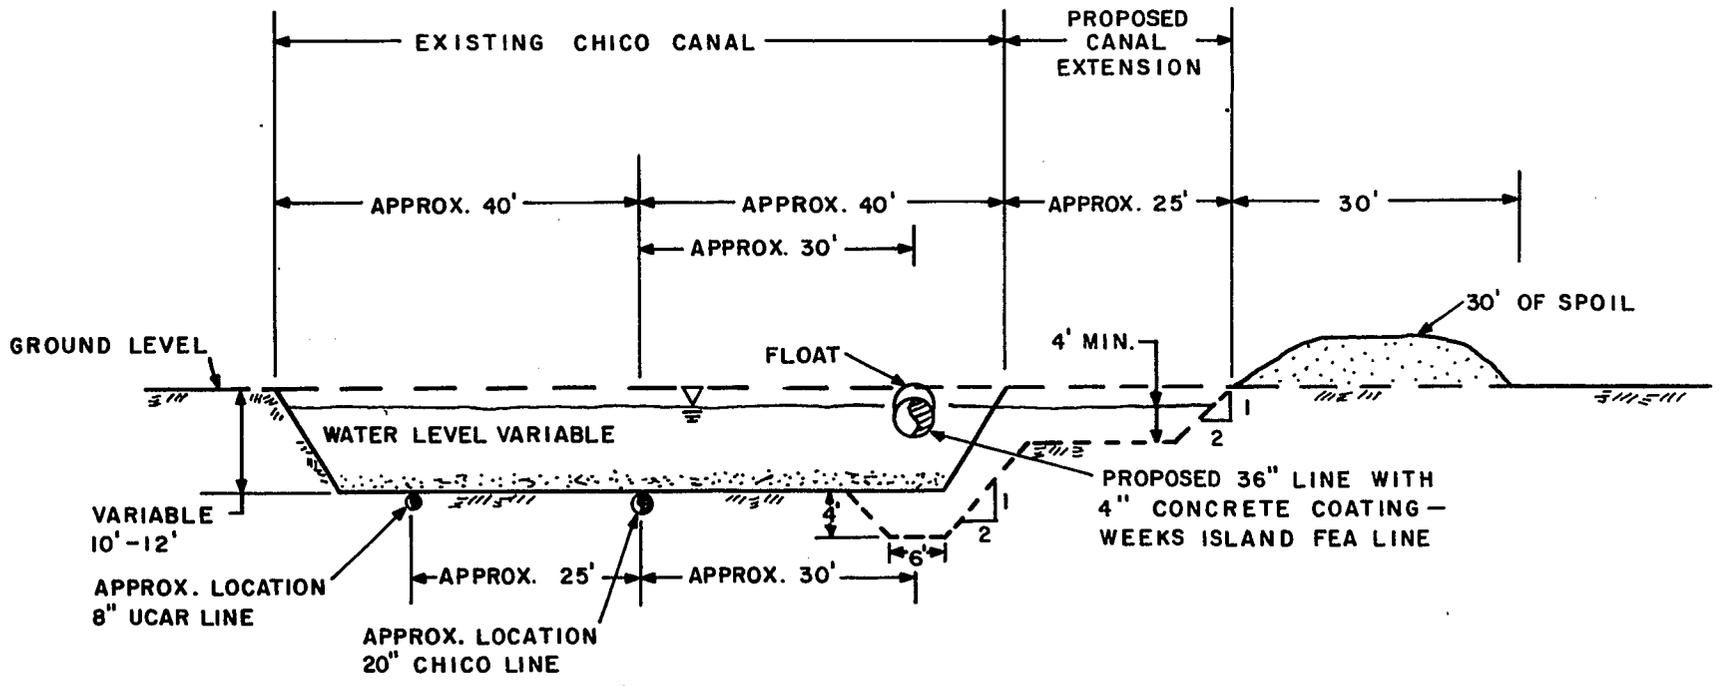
Modified Push Ditch Construction Alternative by Widening Existing Chico Canal.
